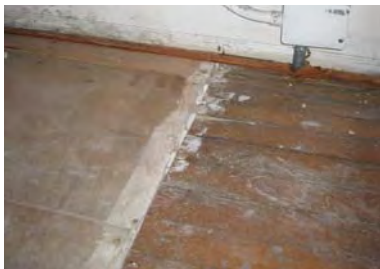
Transition of plywood to pine strip flooring below window W105. (Photo: BBB, 2007)
